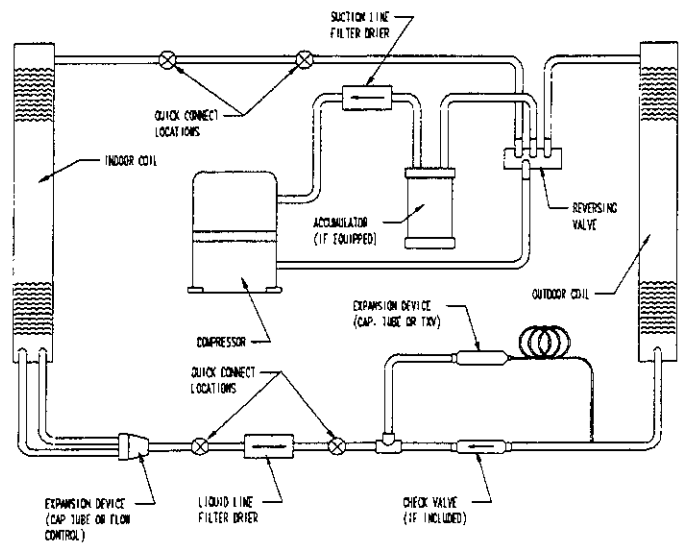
Typical Split System Heat Pump Filter Drier Locations
